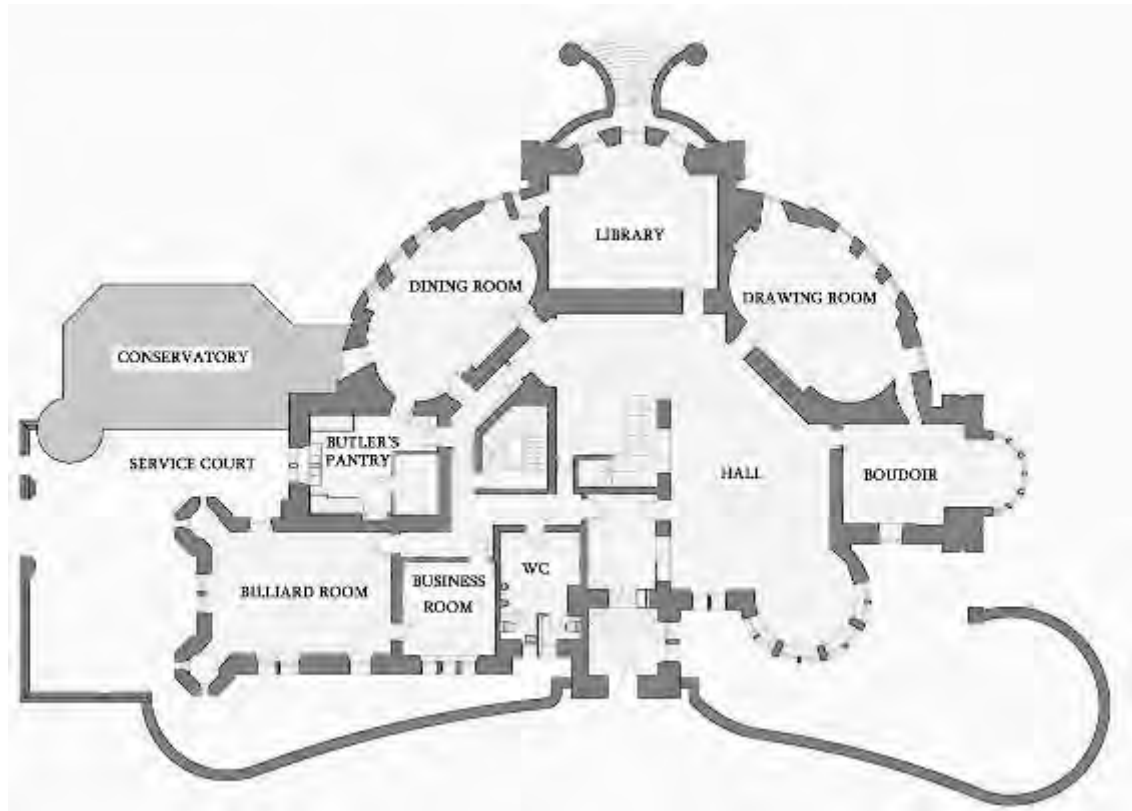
Conjectural plan of principal floor Airthrey Castle after 1891 alterations S&B
